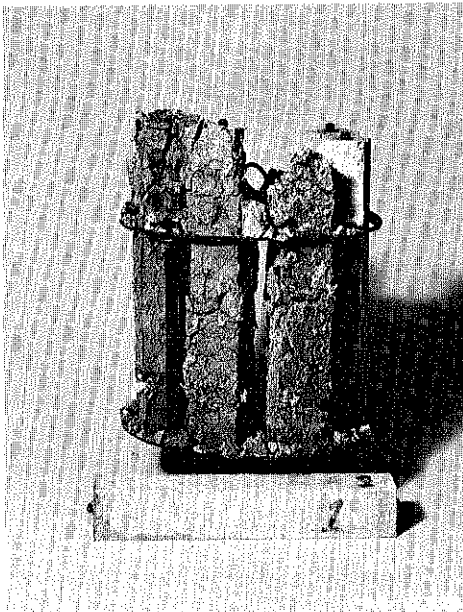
AUTOCLAVE TEST SPECIMENS
